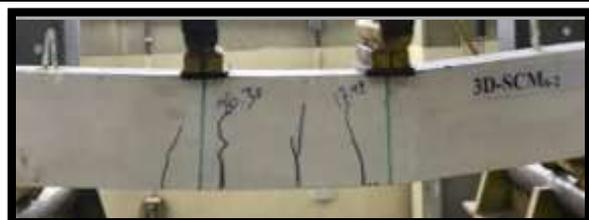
Failure mode and crack pattern for self-compacting concrete beam specimens.
